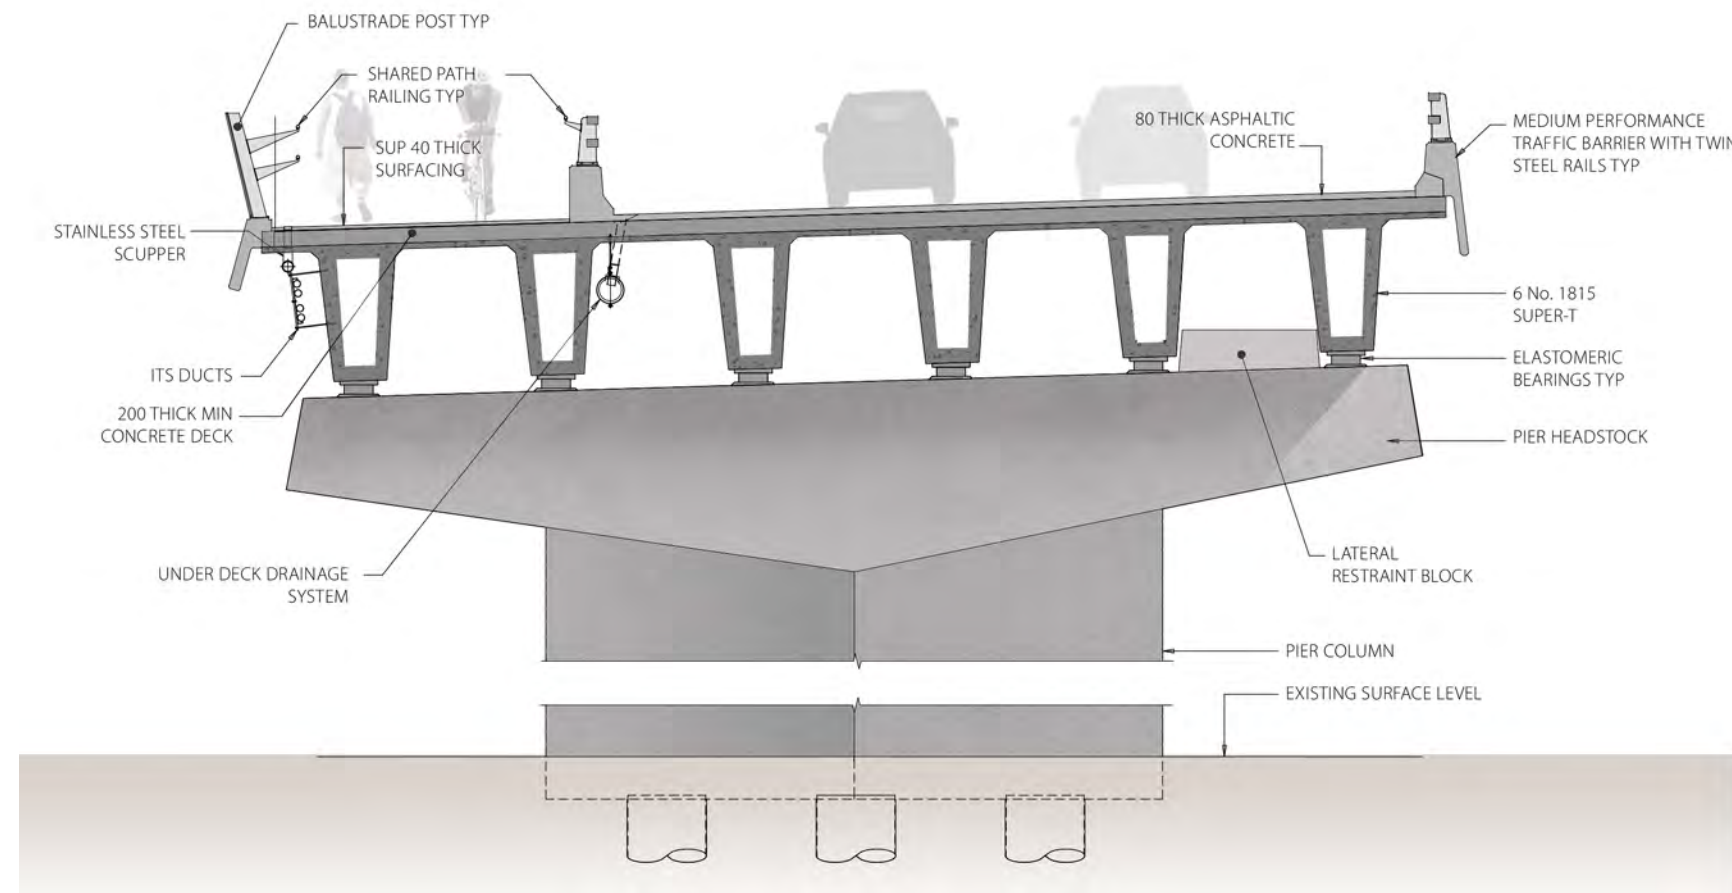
Typical cross section at the approach spans using Super-T girders. The location of ITS ducts will be refined in the next stage of the design. Scale 1:100
